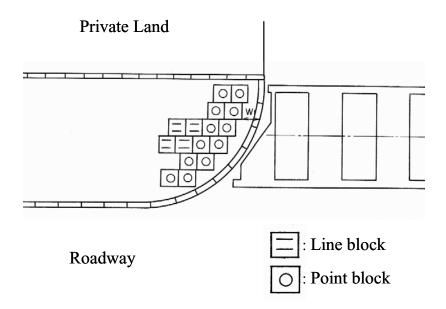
Example of a sidewalk-roadway boundary on a mount-up type sidewalk.
